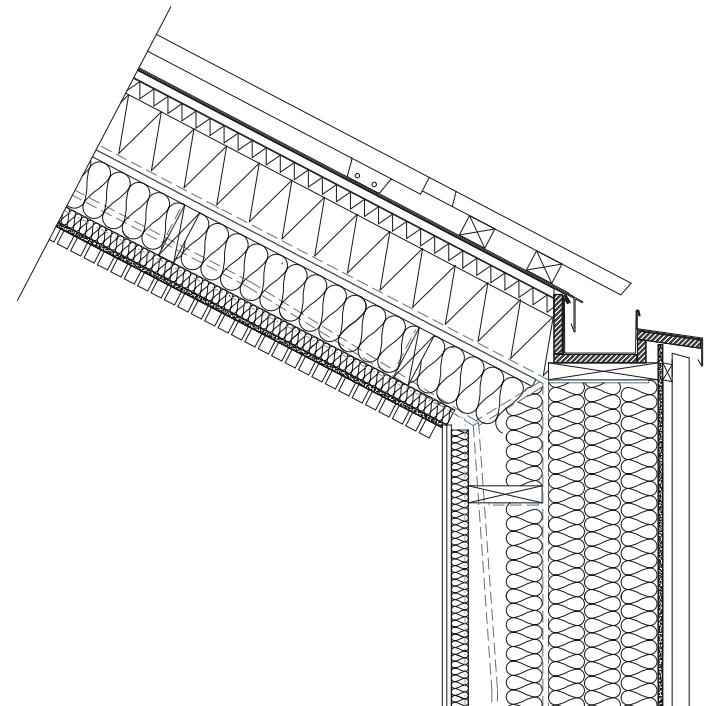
Technical drawing of roof with integrated solar cells and hidden gutter
